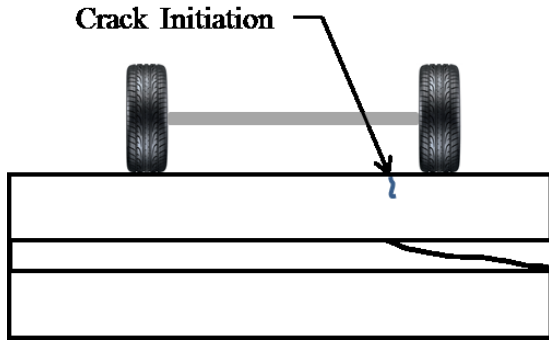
Illustration of condition and mechanism for UBOL longitudinal cracking due to loss of interlayer support along pavement edge.
